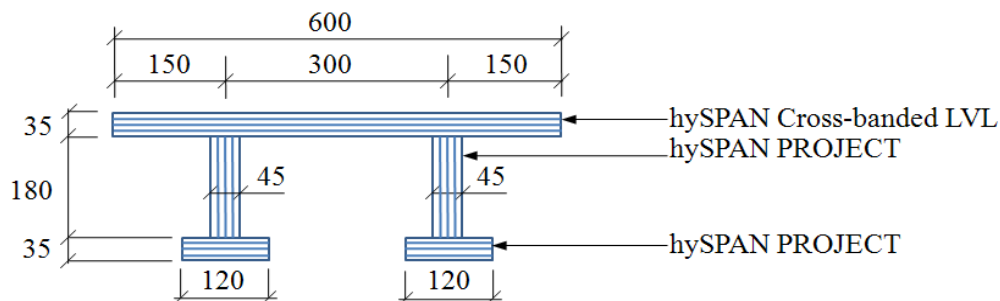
Dimensions of the 6 m span timber beams (mm).
